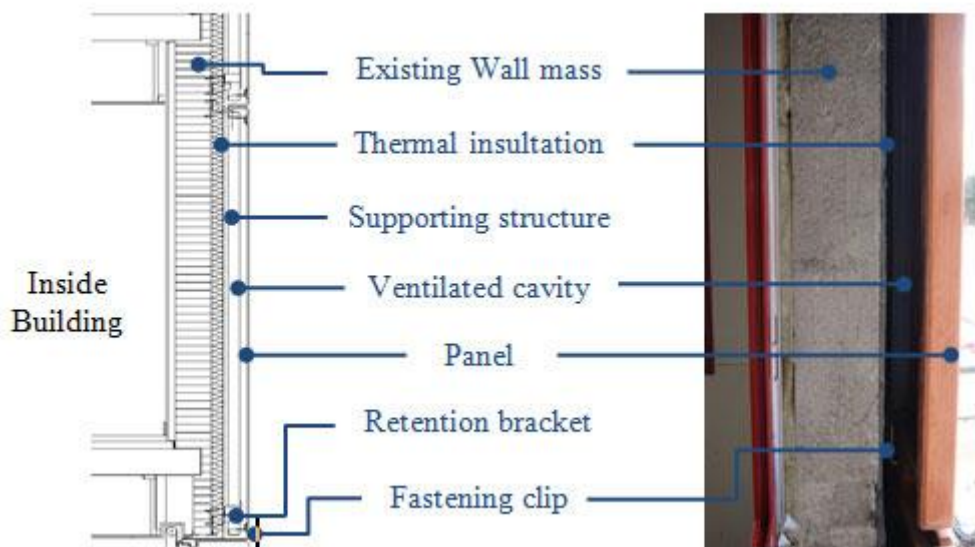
From left to right: open joint ventilated façade design and image of the component installation during building refurbishment.
